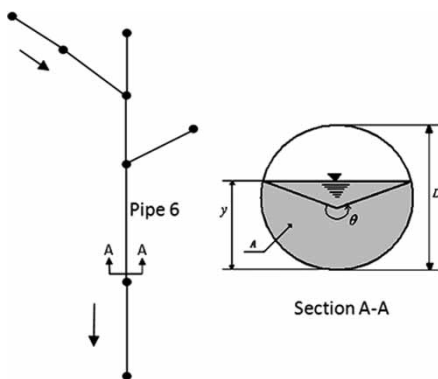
| General layout of a separate domestic sewer system with typical flow section in a circular pipe.
